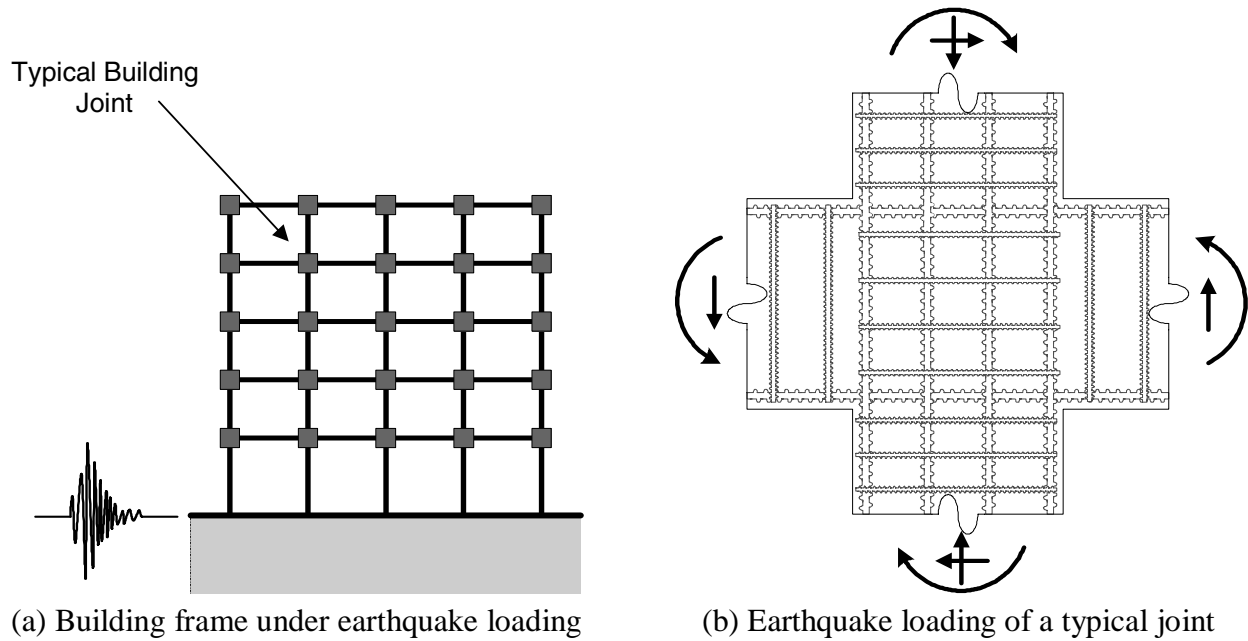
Beam-column joint loads under earthquake loading of a building frame
